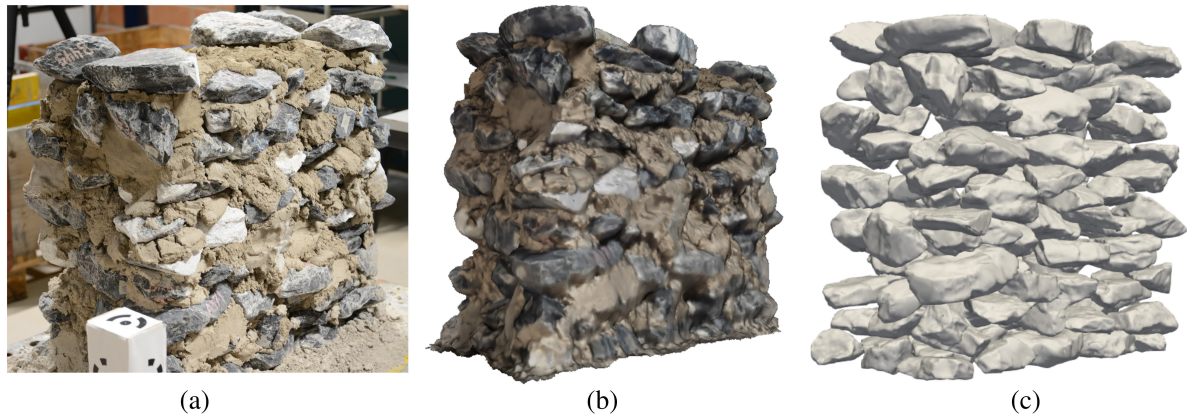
The constructed wall. (a) Photo of the constructed wall. (b) 3D surface model of the final wall. (c) Stones in the final wall on their as-built positions.
